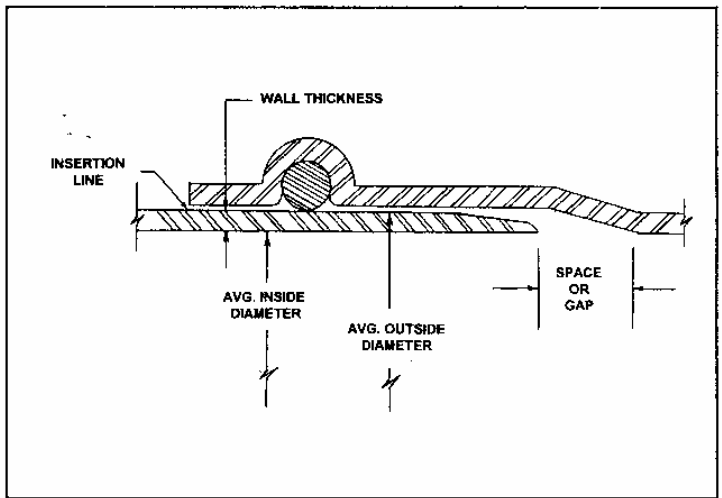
Illustration shows a cross-section of PVC pipe joint.
